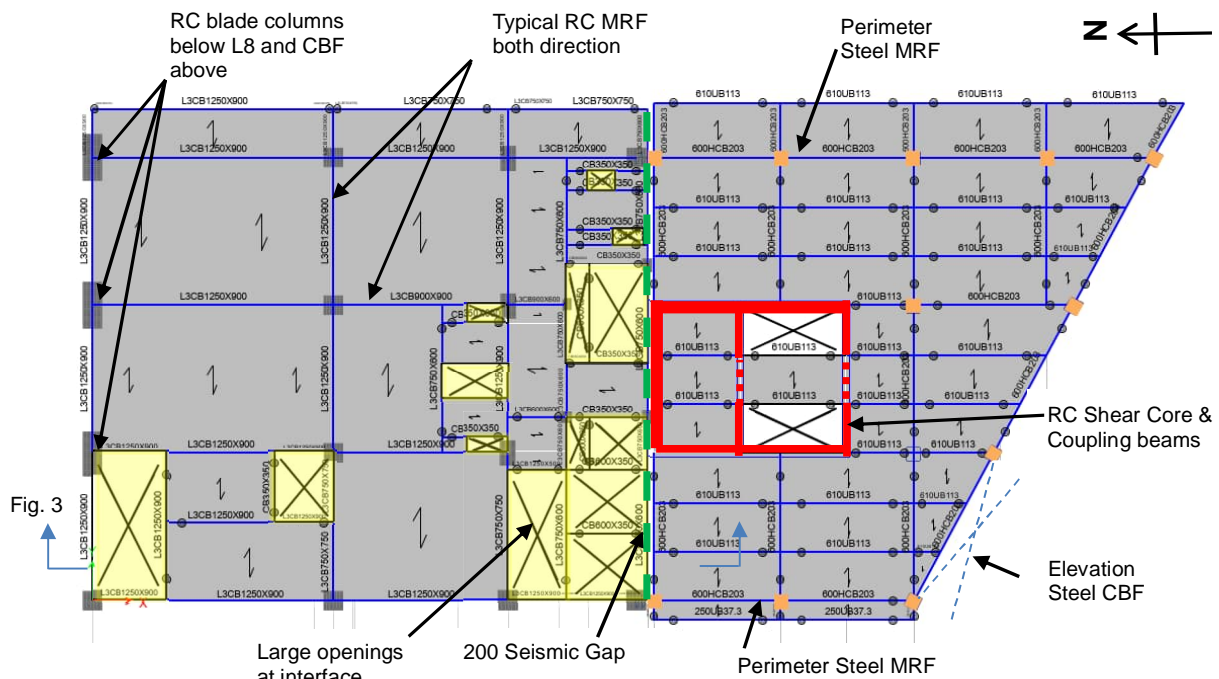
ETABS Model Plan L3 (OSD L6) Showing Stability Elements
